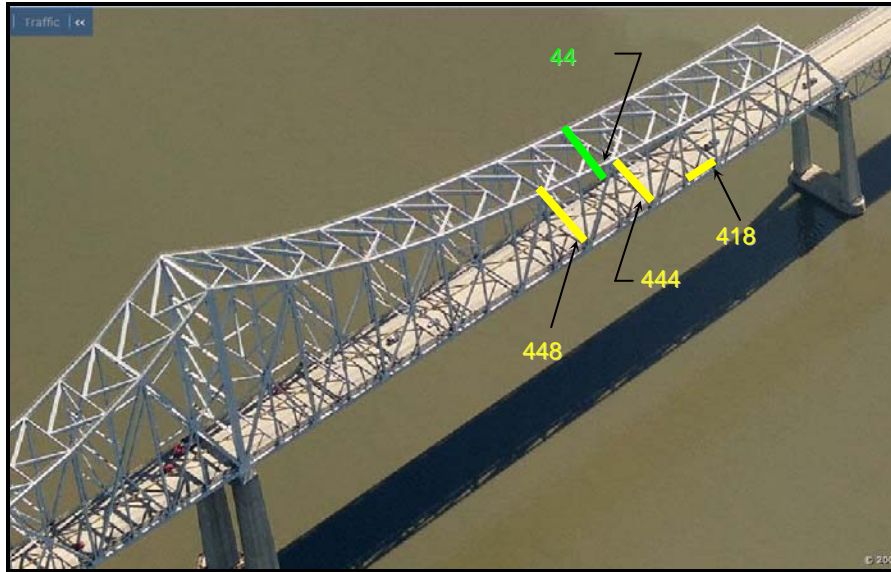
View of New Jersey back span looking upstream showing instrumented truss members (*green = upstream; yellow = downstream*)
